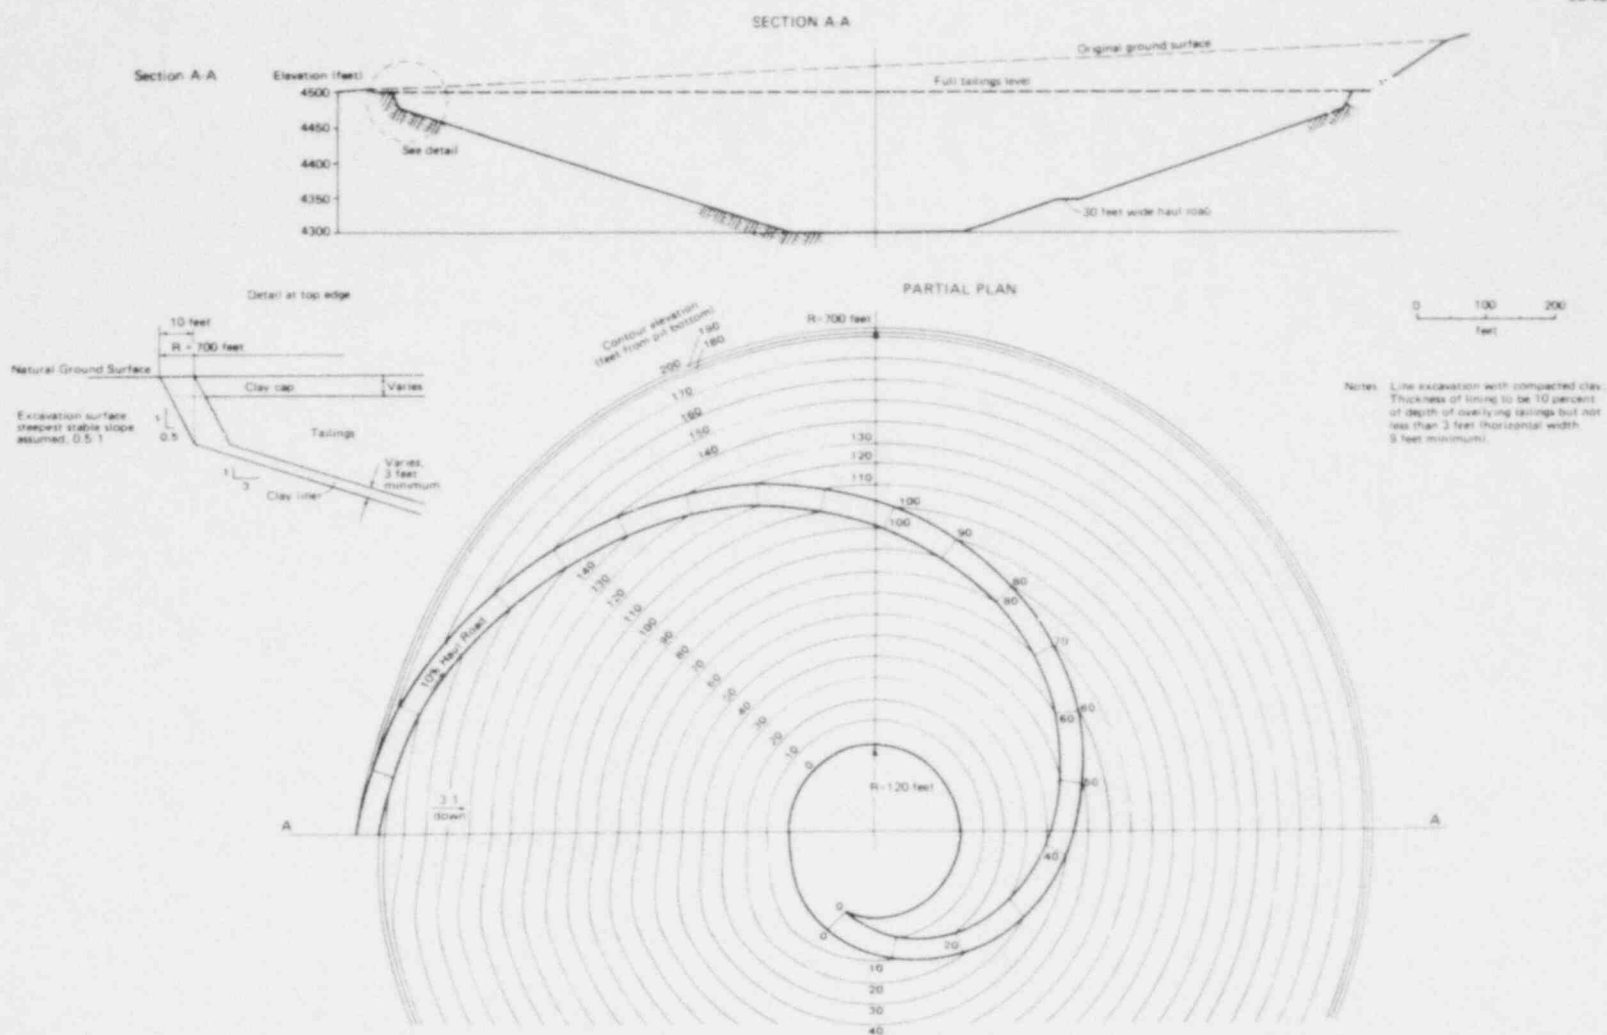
Shooter Canyon Uranium Project tailings disposal study; disposal in excavated pit. Source: Plateau Resources, Ltd., *Tailings Management Plan, Proposed Ore Processing Facility, Shooter Canyon Uranium Project, Utah*, prepared by Woodward-Clyde Consultants, San Francisco, Calif., Rev. June 1978, Fig. 3.
